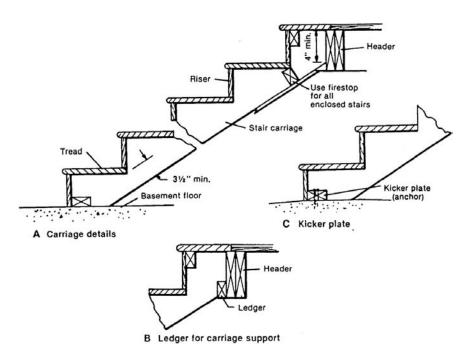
Stair detail. (From Jackson, 1987.)
